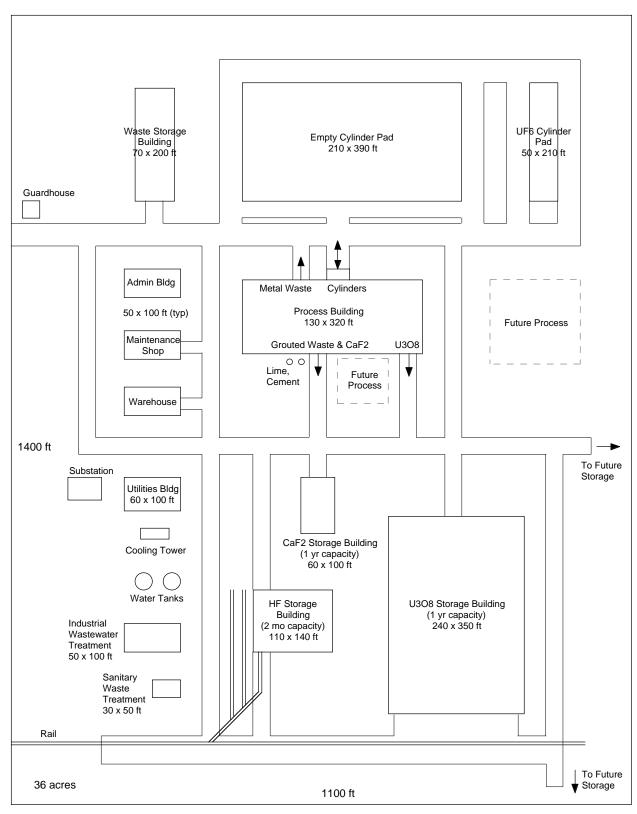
Facility Site Plan Conversion to U3O8 and AHF (25 yr)
